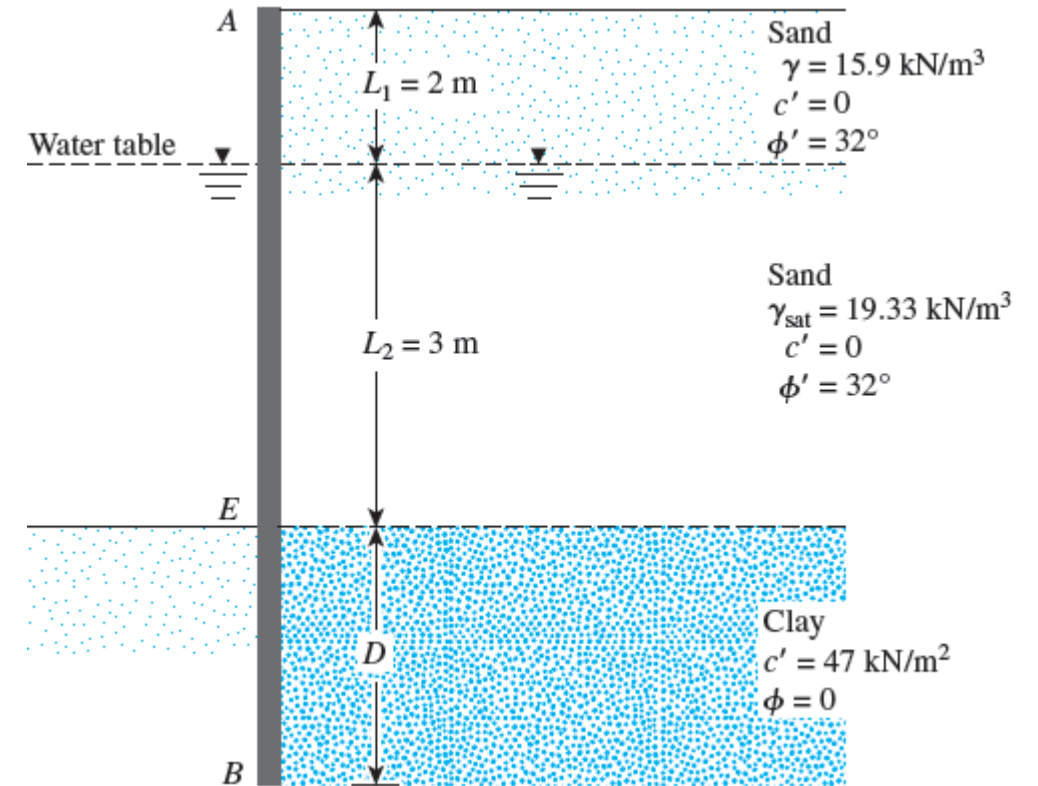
Cantilever sheet pile penetrating into saturated clay
